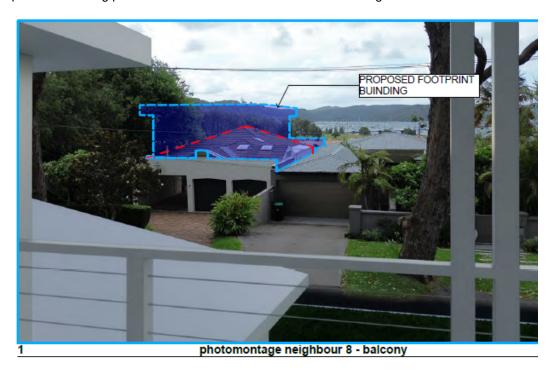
View from upper level balcony adjoining living room of 8 Halesmith Road. Prepared by Action Plans.
